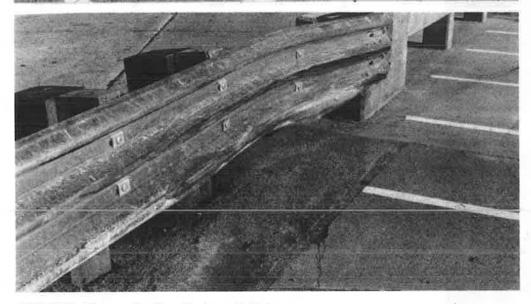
Photographs of test No. 3 guardrail damage.
